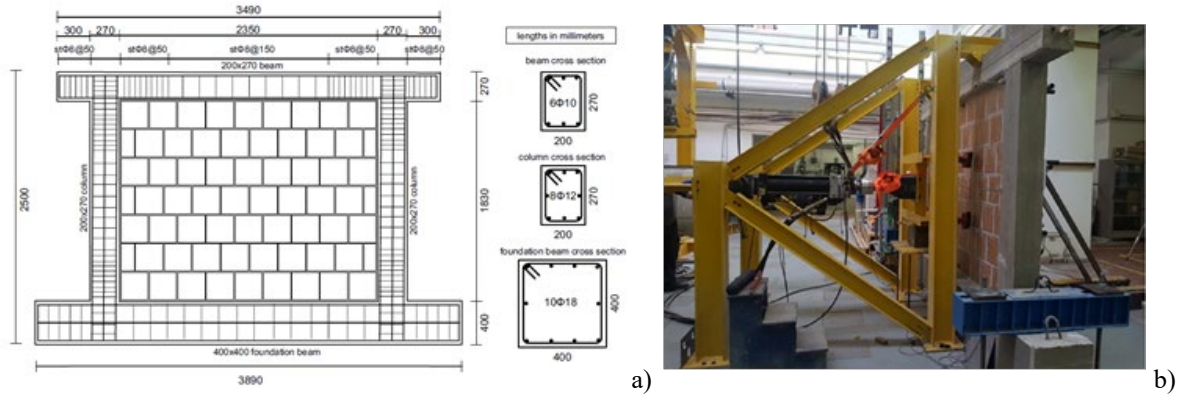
Specimen 80\_OOP\_4E by Ricci et al. 2018 [5]: a) Design details of the specimen; b) Test setup.
